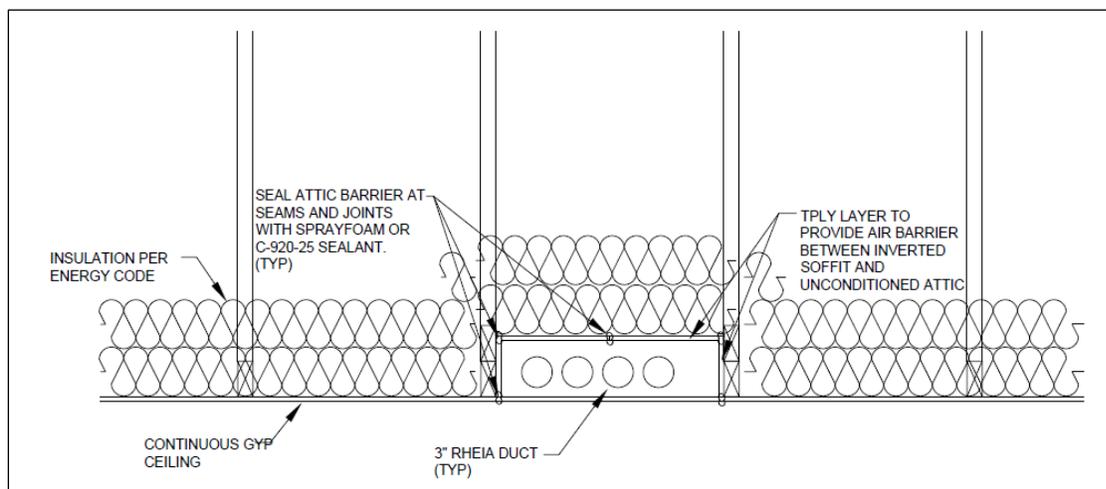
Detail for an inverted soffit running down a roof truss bay.
